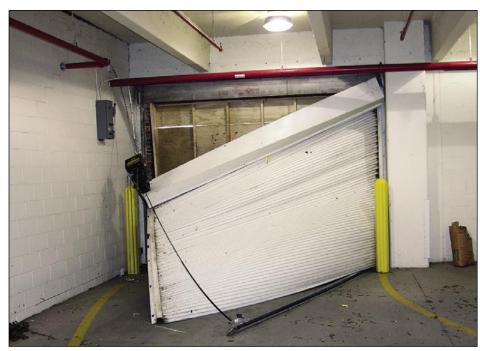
New door that failed. Non-load bearing CMU wall at the left tilted (see Figure 5-8) (Punta Gorda).
